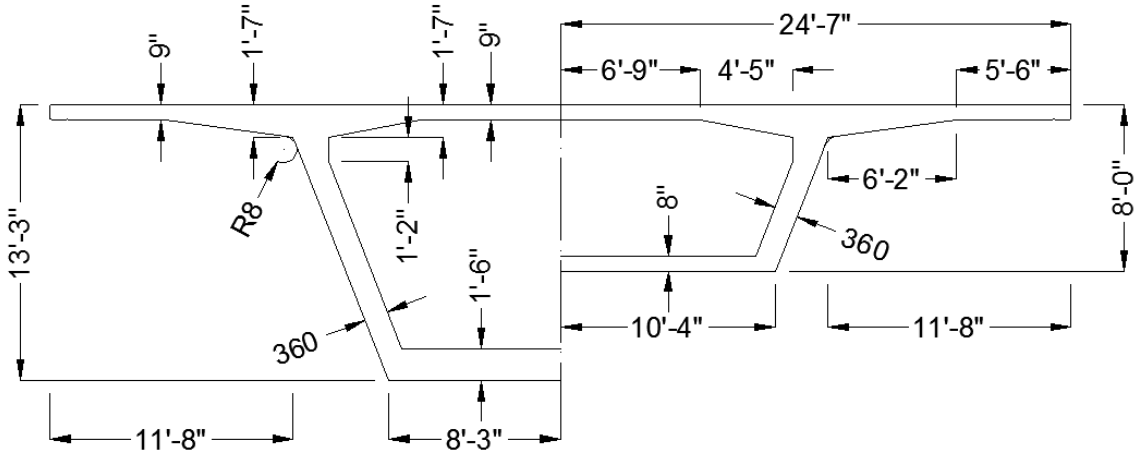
Seabreeze Bridge Variable Depth Box Girder Pier and Midspan Cross Sections
